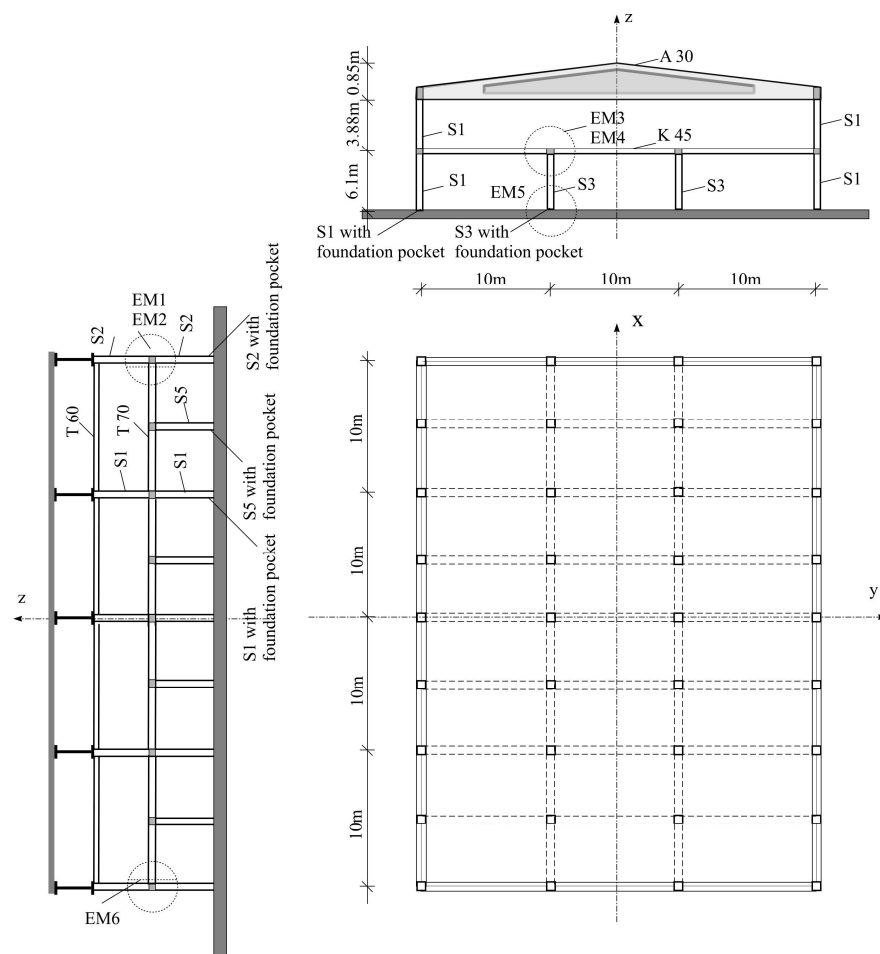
Ground floor layout, longitudinal and transverse section of the industrial hall (tested connections are marked and designated as EM-1–EM-6).
